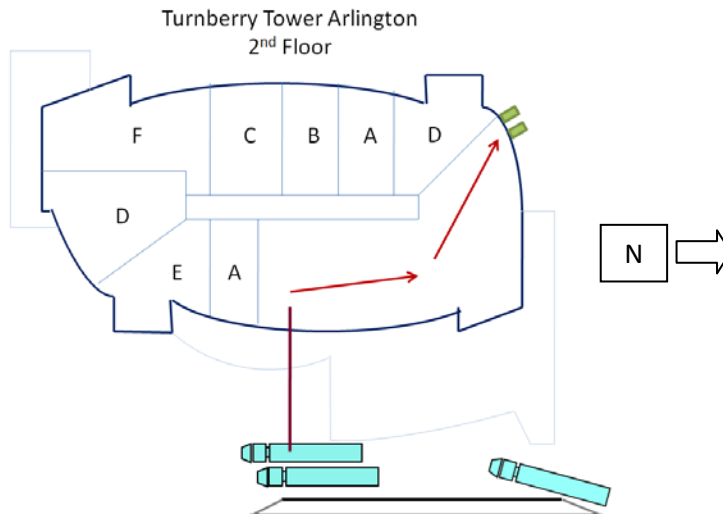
Propose 2<sup>nd</sup> Floor of Turnberry Tower Arlington during Drywall Delivery
